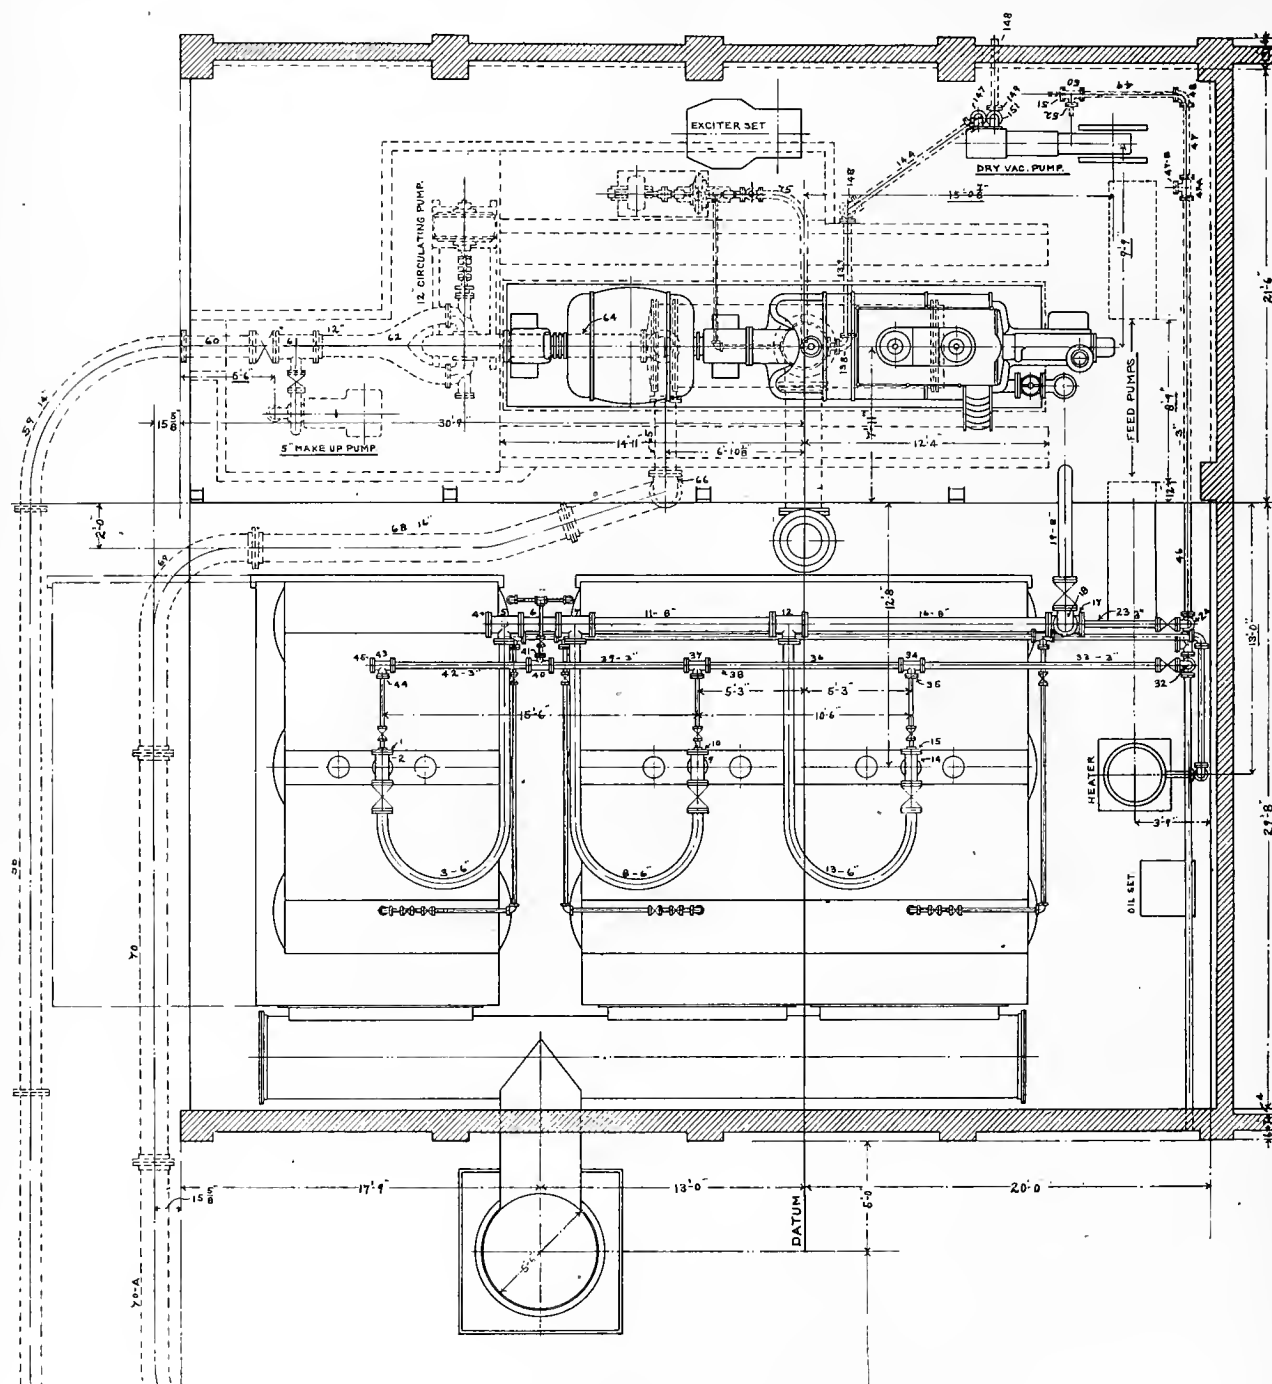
PLAN OF POWER HOUSE, MT. WHITNEY POWER CO.
